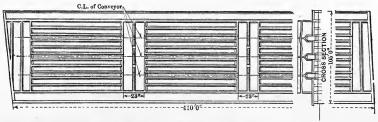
Foundation plan of cement stock-house, Hudson Portland Cement Co.
